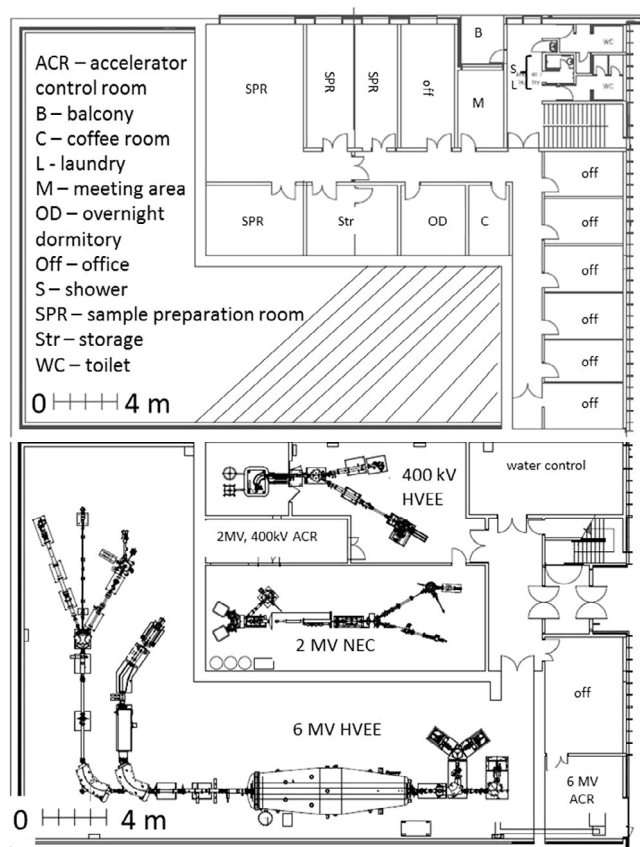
Scale layout of KIST ion beam facilities. Top panel shows second floor, bottom panel shows ground floor. The accelerators are described in more detail in Fig. 2.
